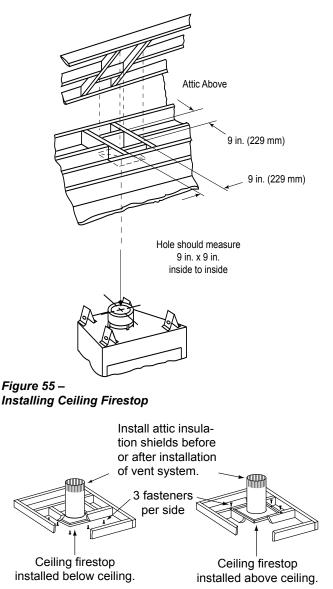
Installing Ceiling Firestop & Attic Insulation Shield
